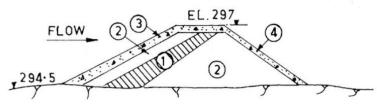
Typical section of erodible bund: Mnjoli dam - Swaziland [7] 1 – Impervious core; 2 – filter sand; 3 – a blanket of concrete (500 mm); 4 – ditto (150 mm)
